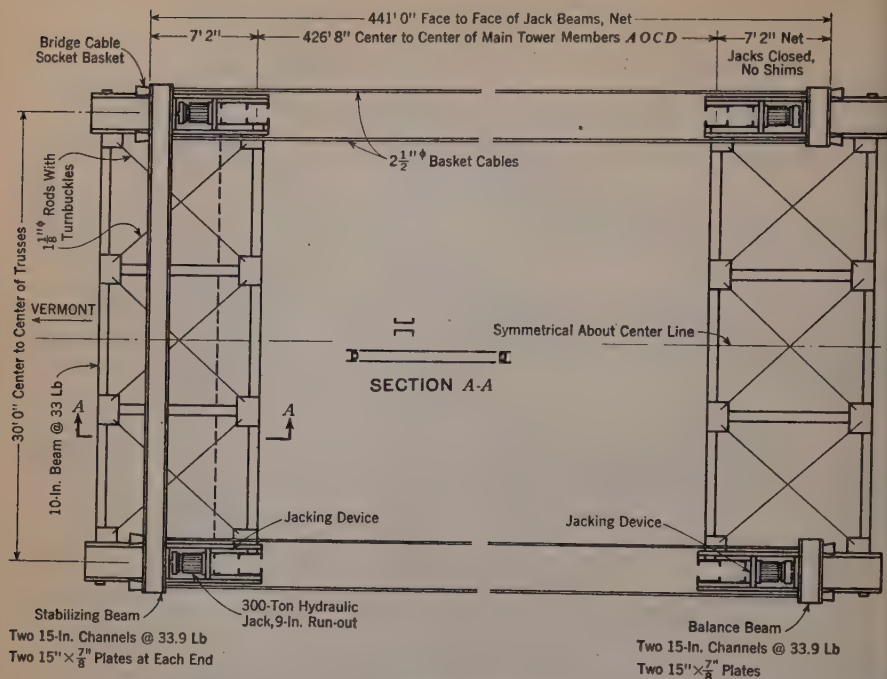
LAYOUT OF JACKING DEVICE, SHOWING ARRANGEMENT OF JACK BEAMS AND STABILIZING BRACES
